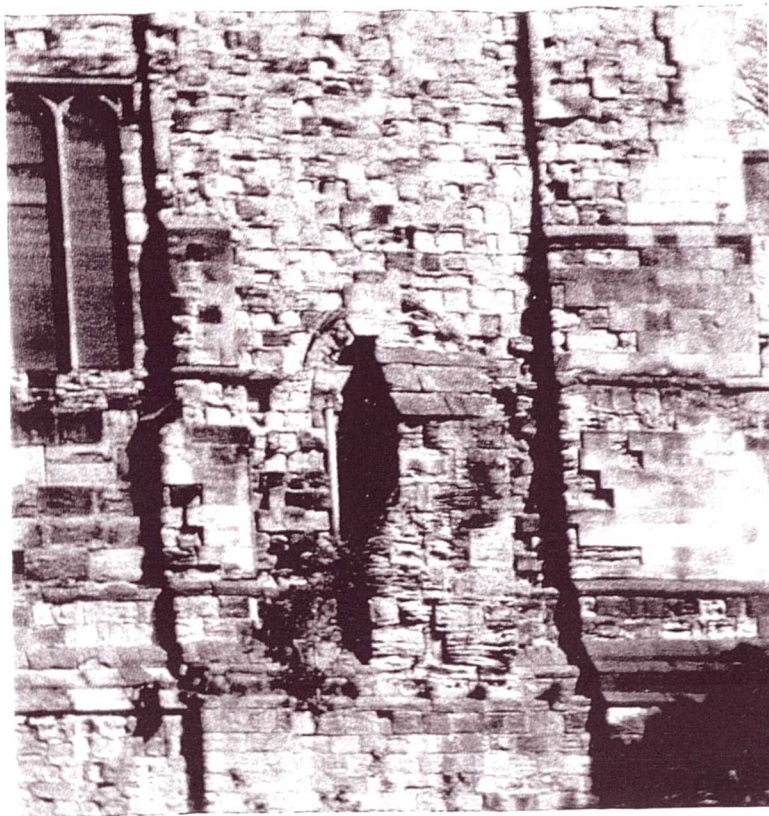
Detail of blocked opening in the west wall of the Kitchen Tower
